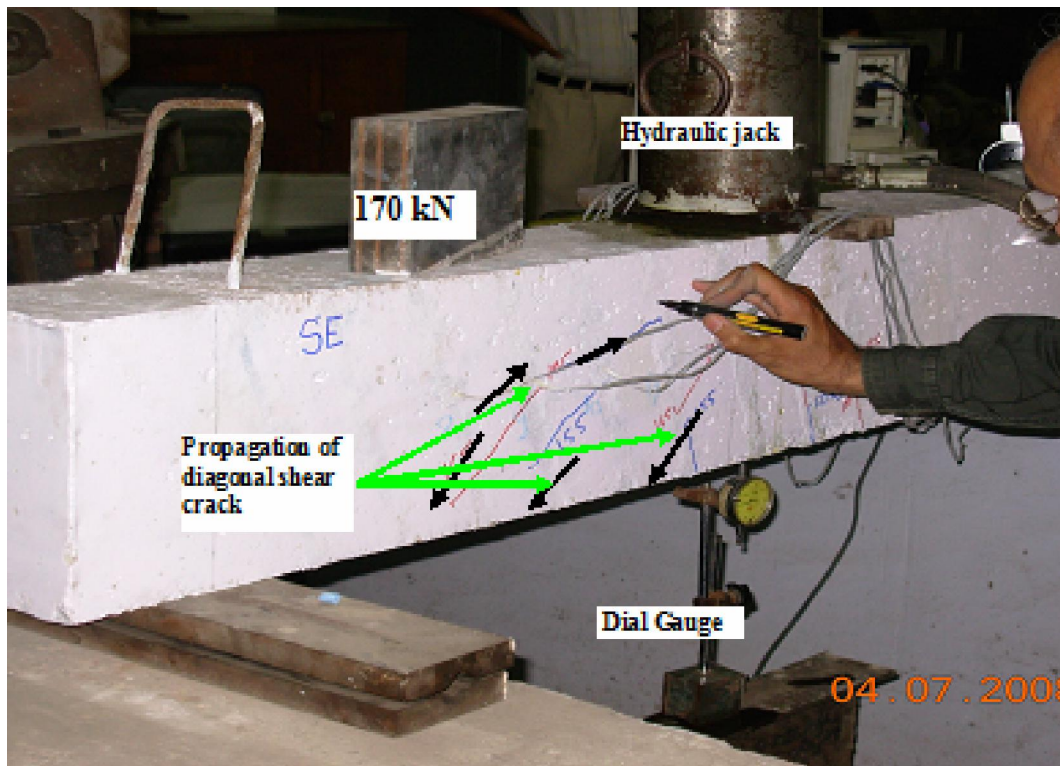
Test B1-SS crack pattern at 170 kN (Face SE)
